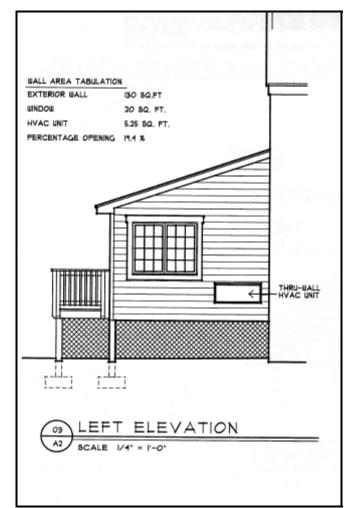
Drawing of the enclosed porch viewing from Left Elevation
